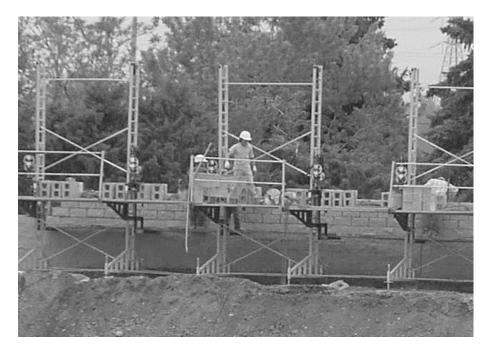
Masonry Noise Barrier Construction: I-270 West of York Street
